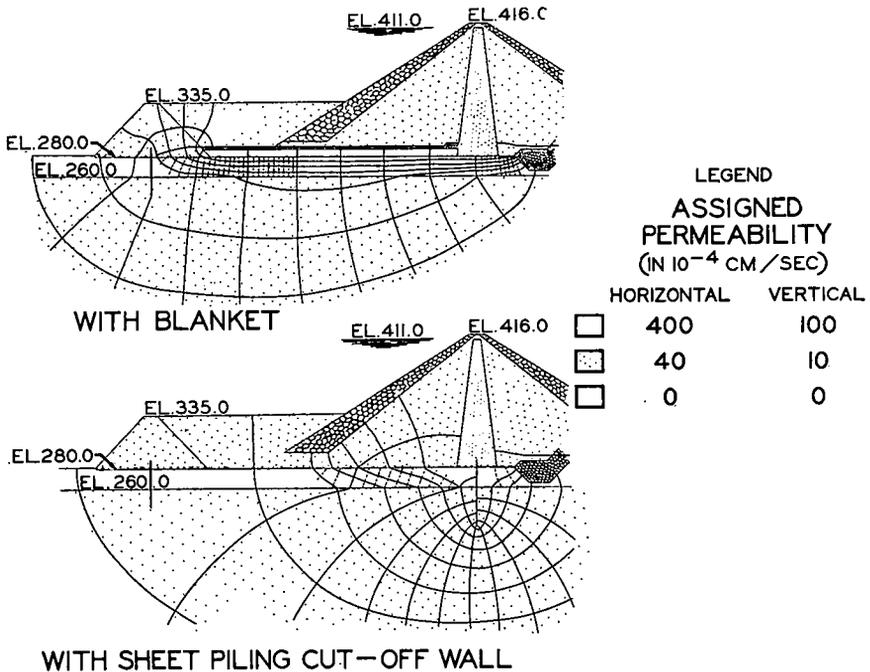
FRANKLIN FALLS DAM. FOUNDATION SEEPAGE STUDIES.
